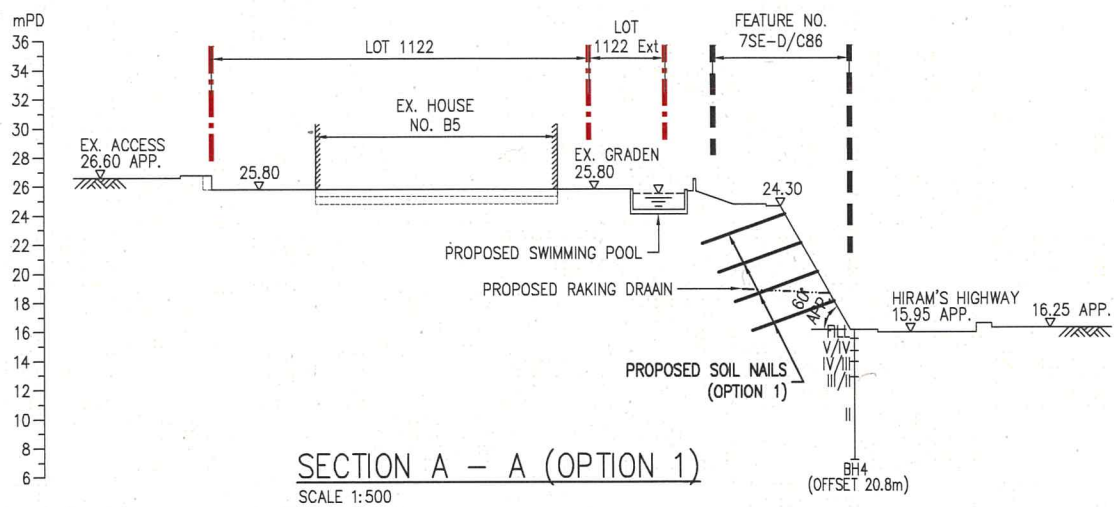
SECTIONS AND TYPICAL DETAILS
